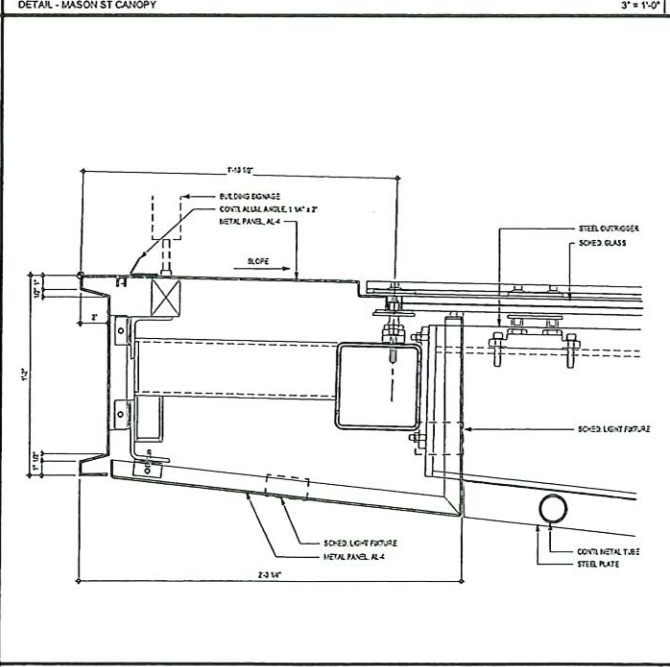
DETAIL - MASON ST CANOPY 3" = 1'-0" 15
